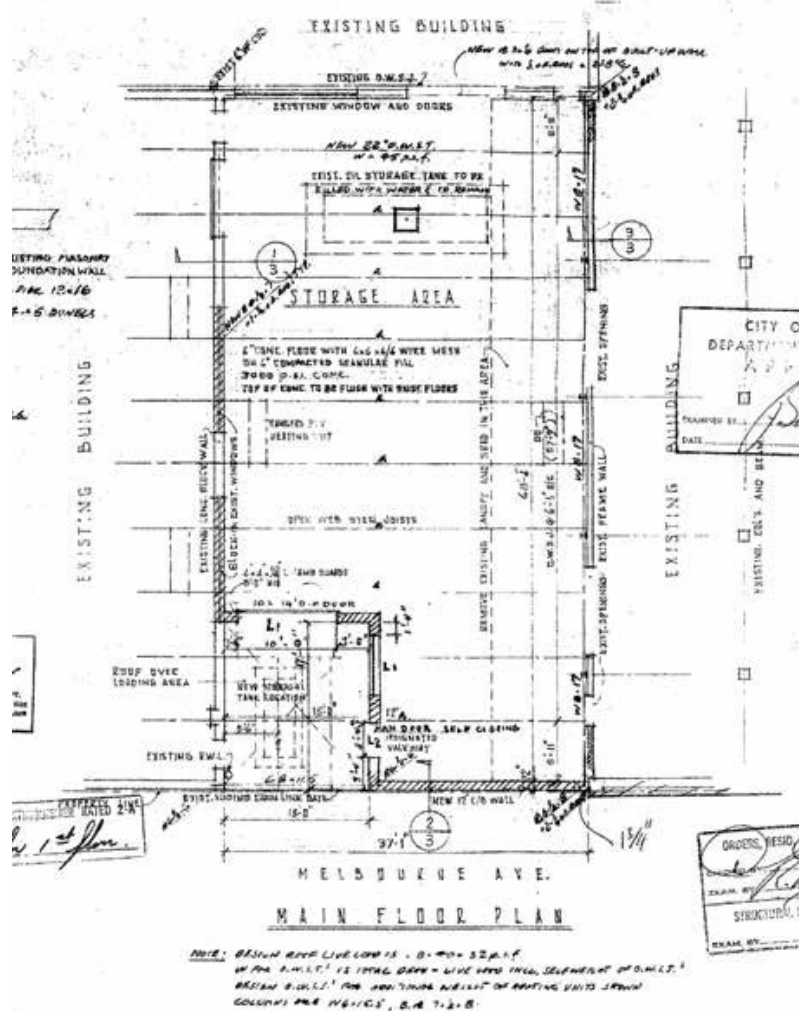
1977 main floor plan drawing by Astral Building Co for the Seco Tool Company property at 2 Melbourne Avenue (City of Toronto Building Records)
